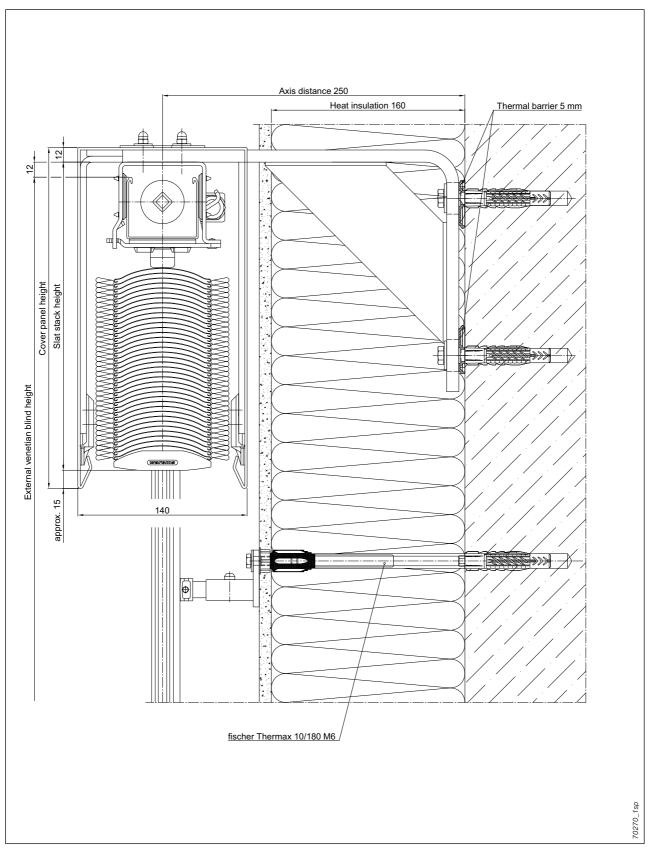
Mounting example for external venetian blinds E 80 A6 S with adjustable U-shaped cover panel
